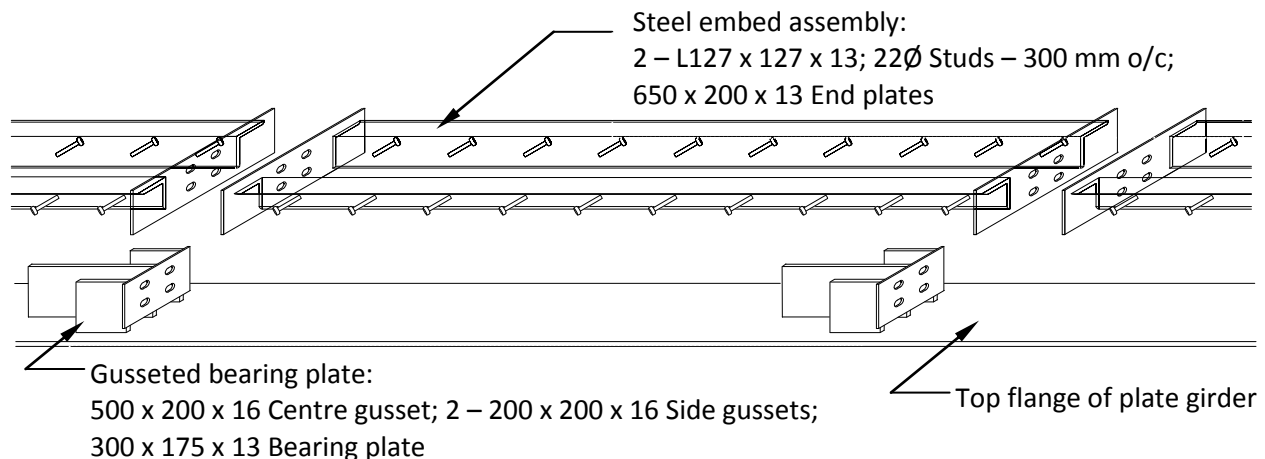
Schematic View of a Composite Girder with Panel End Connections
